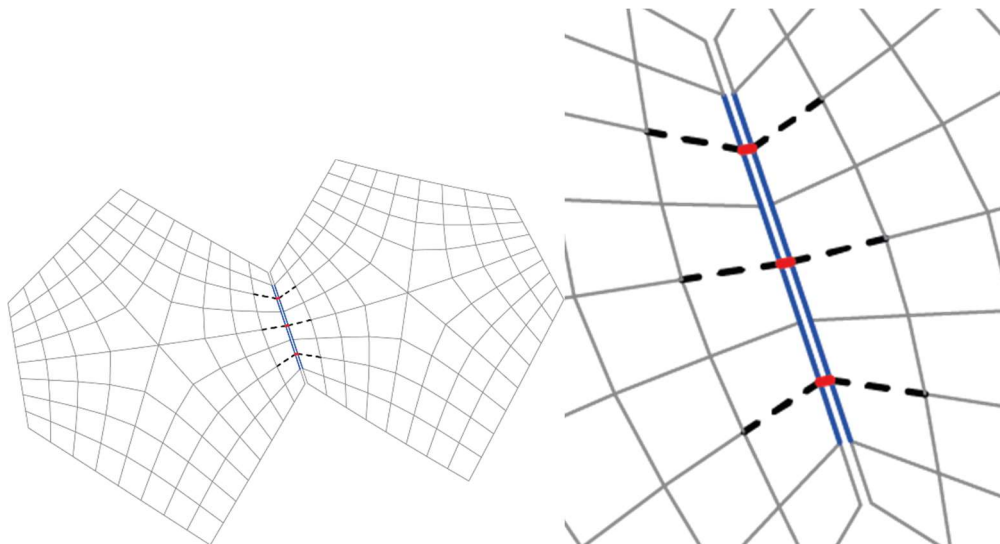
Modelled panel connections. Connection plates are in red, panel face reinforcement in blue and back anchoring is dotted.
